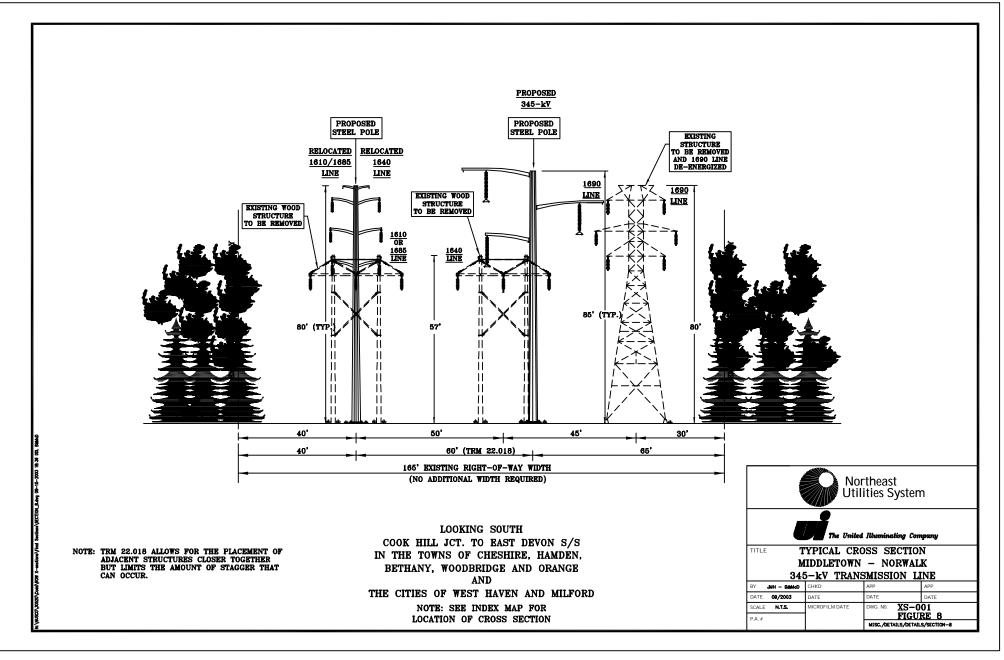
Cross section 8 - Cook Hill Junction to East Devon Substation (Cheshire, Hamden, Bethany, Woodbridge, Orange, West Haven, Milford) Cross section 8B - Cheshire Town Line to East Devon Substation (Hamden, Bethany, Woodbridge, Orange, West Haven, Milford)
